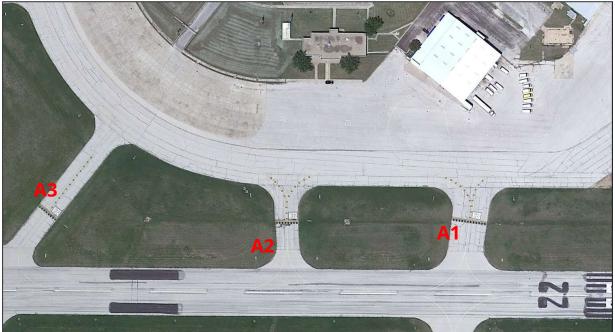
Taxiway A1, A2, and A3 Intersection with Runway 4/22
